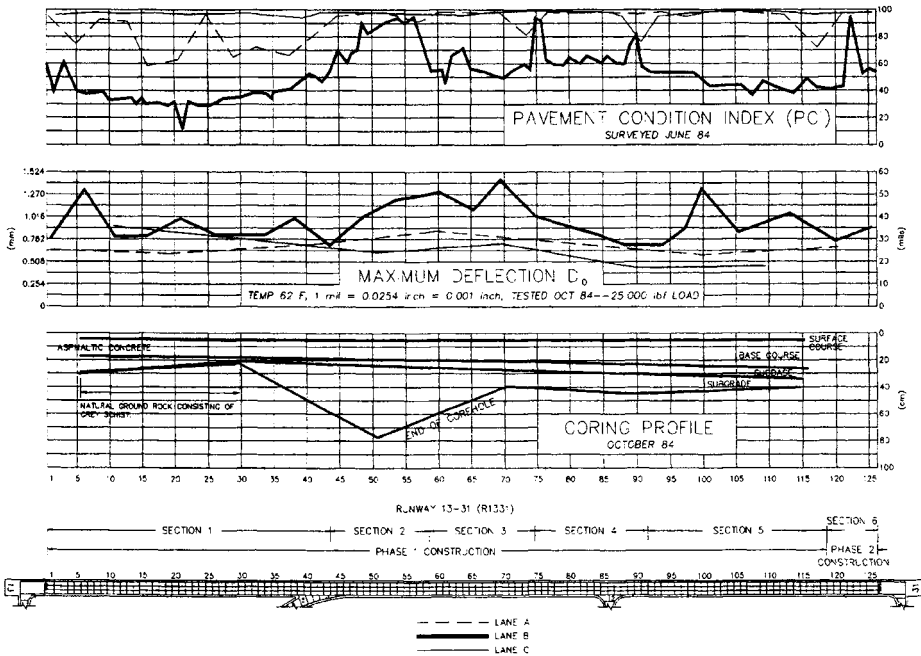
Example Use of Distress Condition Index, Deflection, and Coring Profiles for Runway Division into Sections. (From Engineering and Research International Consulting Reports 1984).
